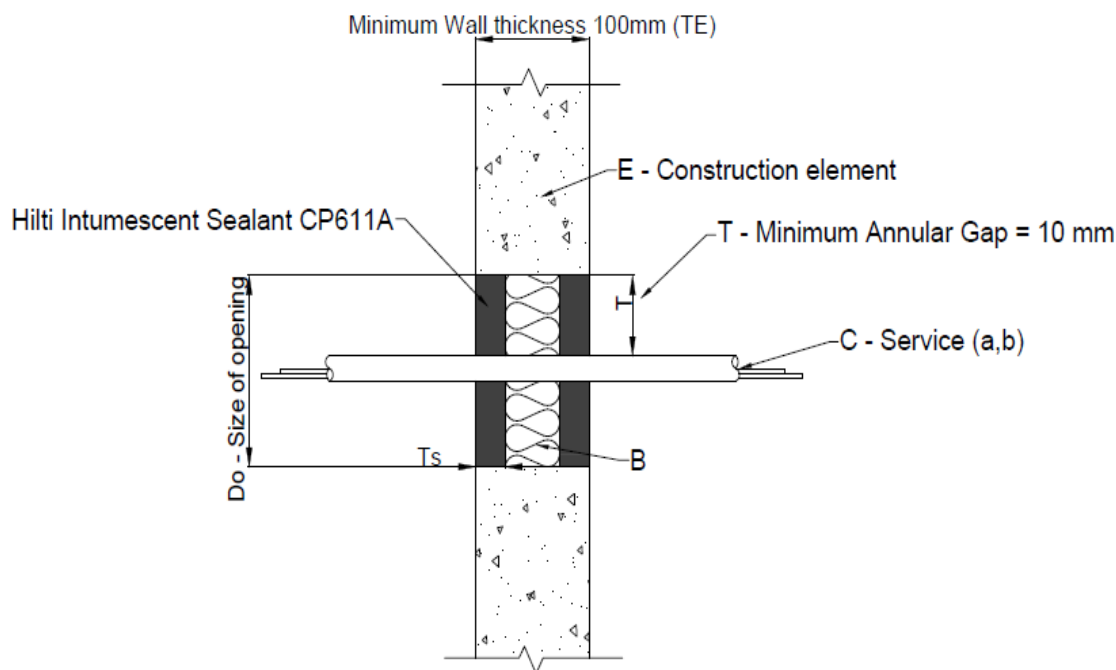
Side view, seal Type 2, 100mm concrete wall, CP611A Steel conduits $\leq 16\text{mm}$ OD refer to table 16
